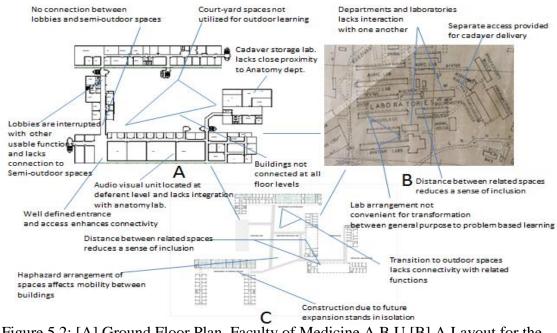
[A] Ground Floor Plan, Faculty of Medicine A.B.U [B] A Layout for the Faculty of Medicine UI [C] Ground Floor Plan, Faculty of Medicine UJ
